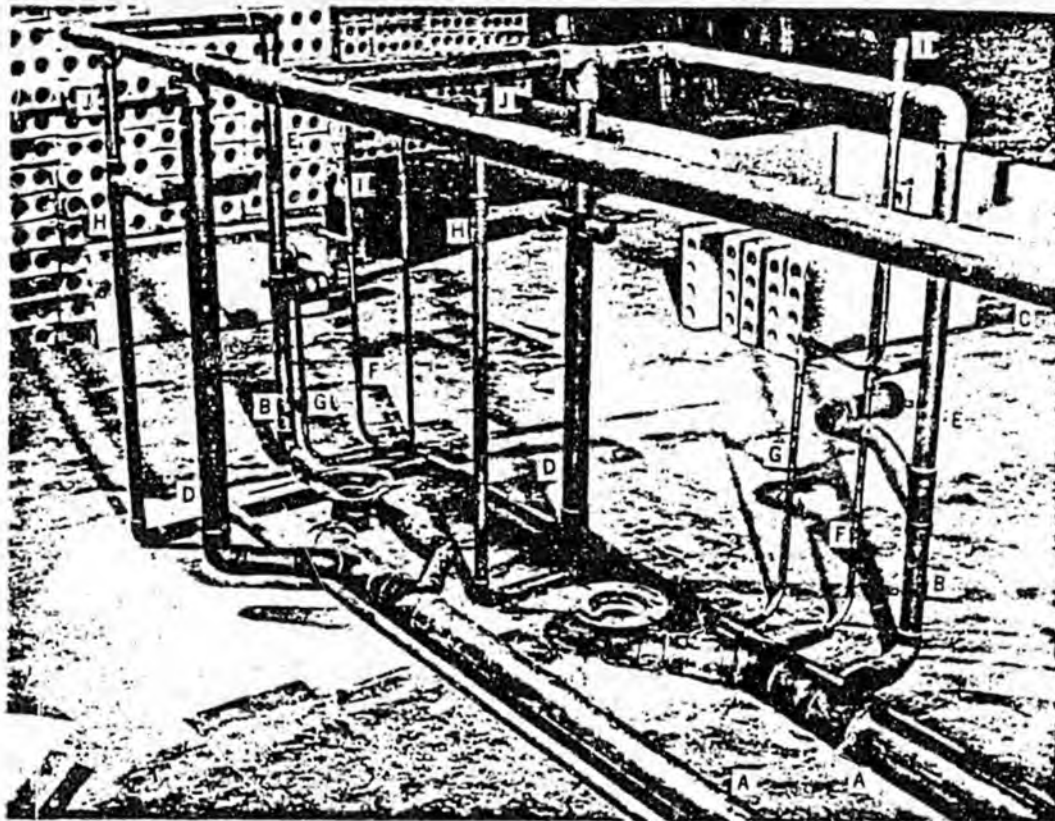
AN EXAMPLE OF PLUMBING ROUGHING FOR TWO LAVATORY ROOMS IN A FIREPROOF OFFICE BUILDING
